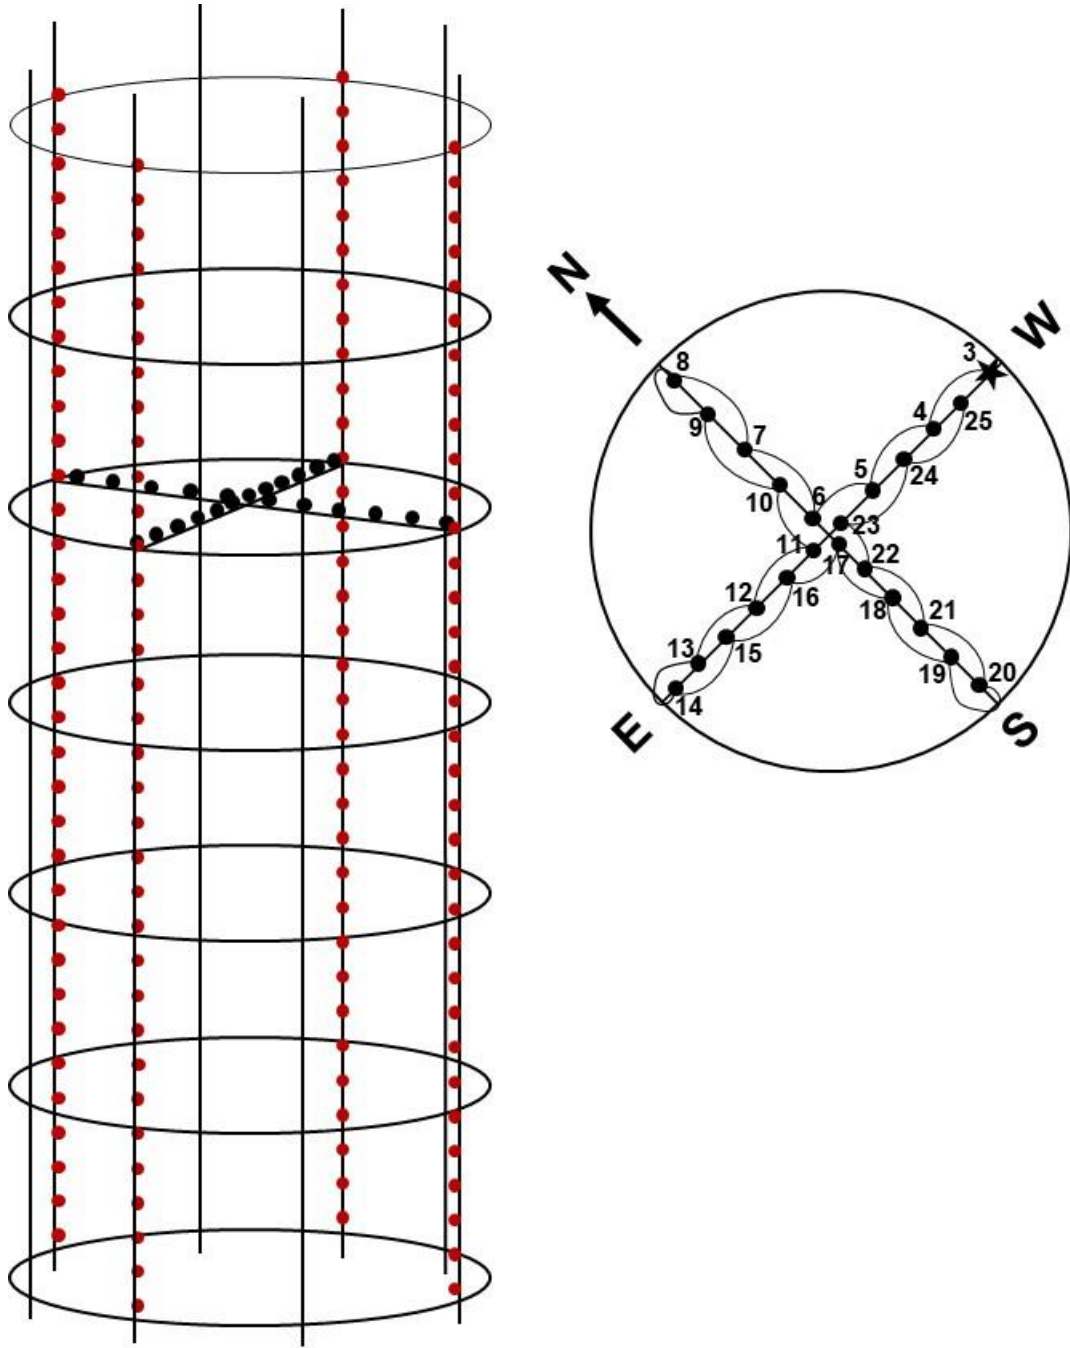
Sinclair Hills drilled shaft thermal sensor layout schematic.
